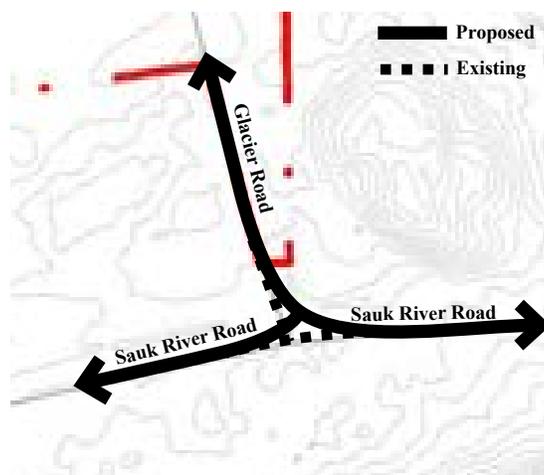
ROAD REALIGNMENT OF THE INTERSECTION OF SAUK RIVER ROAD & GLACIER ROAD
